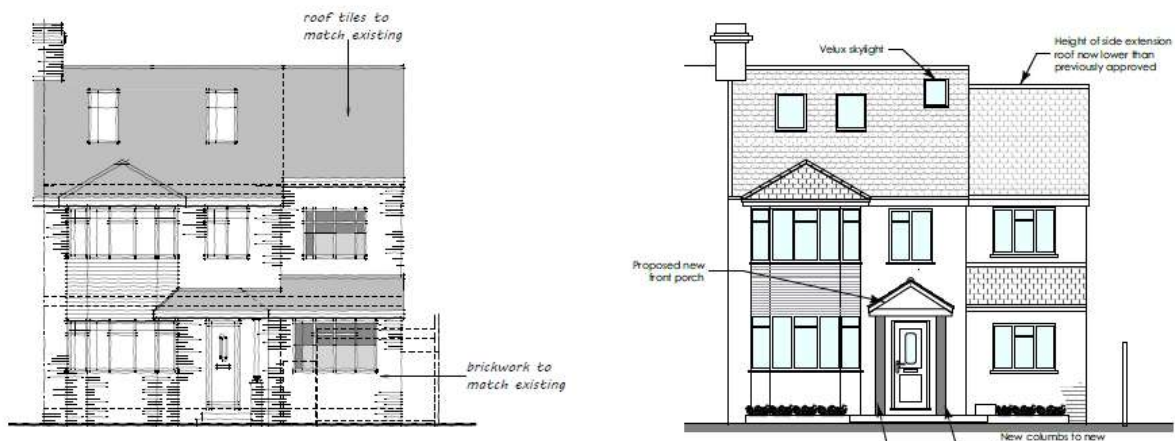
previously approved front elevation (left) and proposed front elevation (right)
